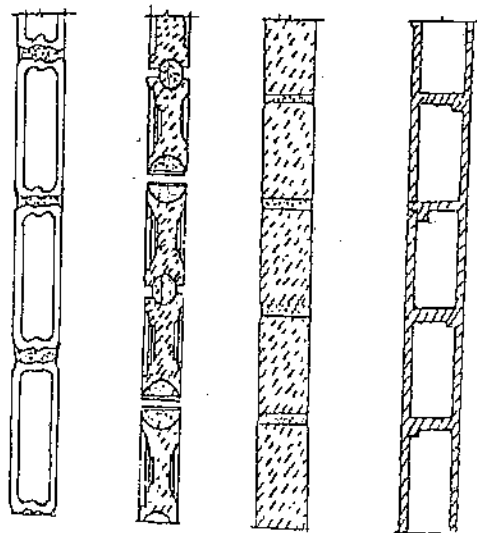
REINFORCED BRICK WORK RETAINING WALLS.
